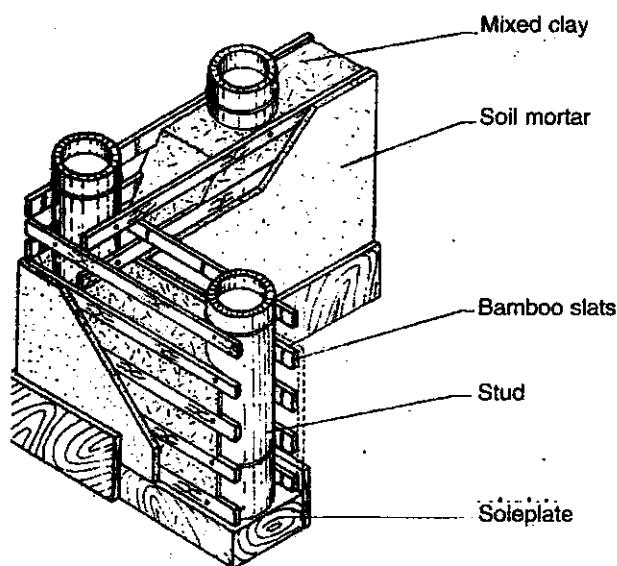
Fig.C This type of wall is very heavy and generally is used in the construction of the first floor. On the 2nd floor, a double bamboo board wall is used.in most of the cases.
